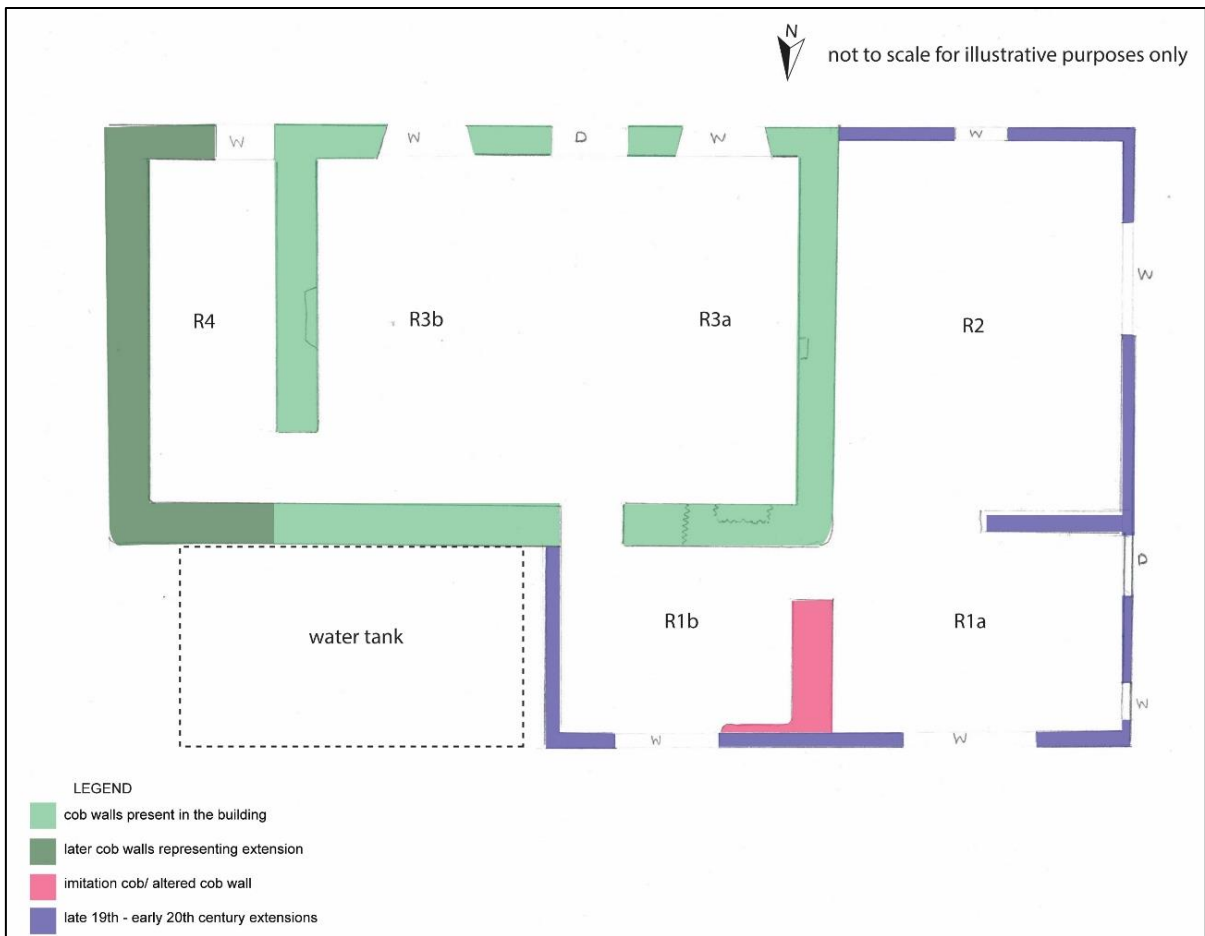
BUILDING PLAN OF THE MAIN HOUSE, SHOWING APPROXIMATE LAYOUT, NOT TO SCALE.
